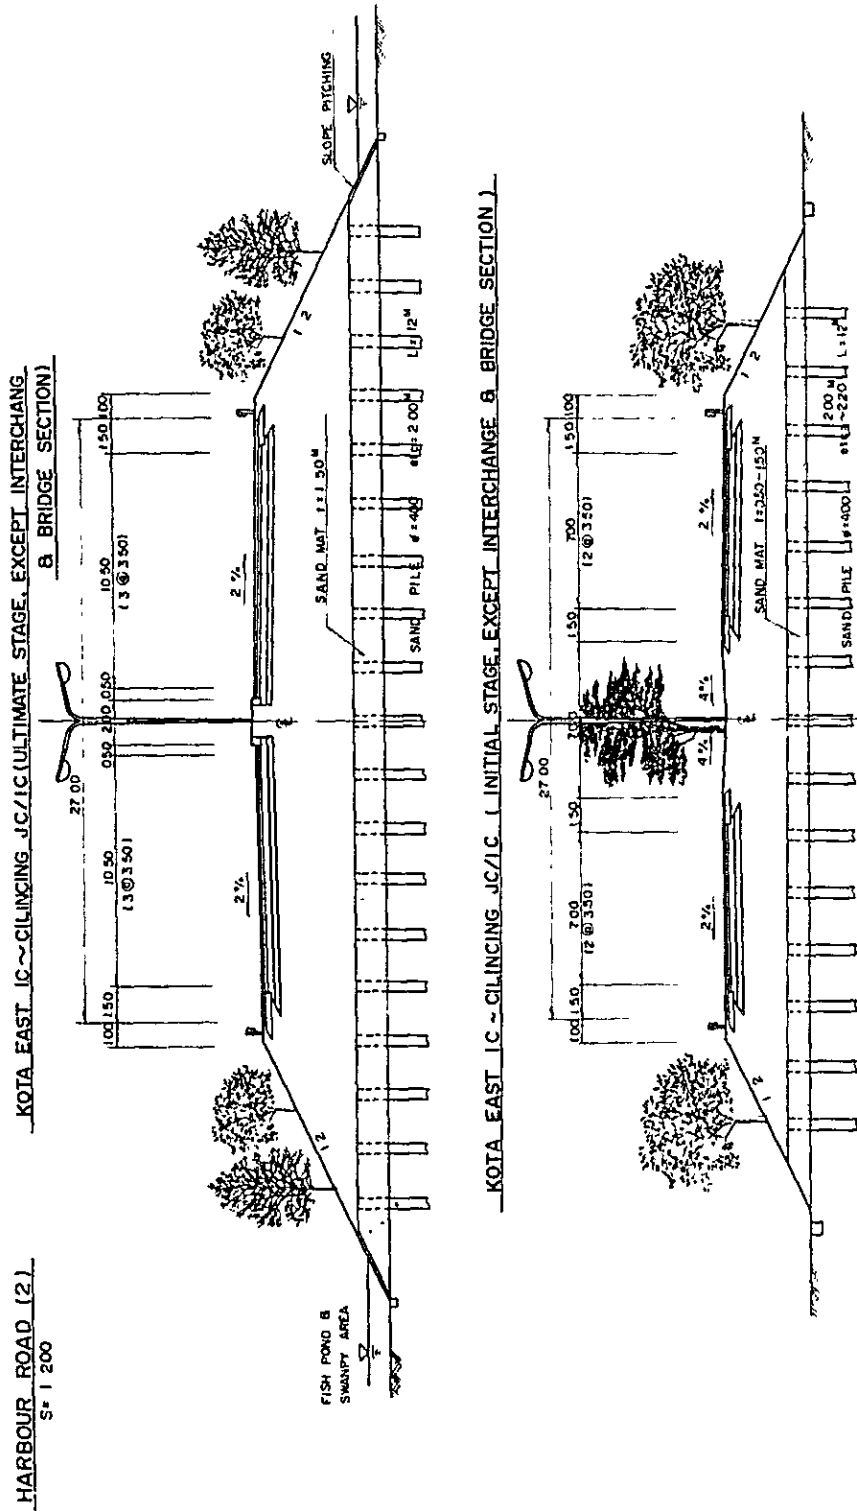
Typical Cross Section of Harbour Road (2)
